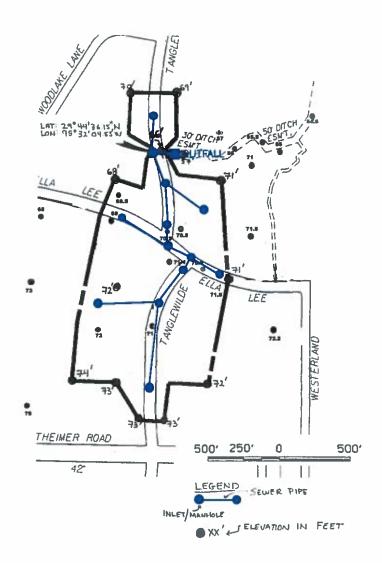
Tanglewilde Drive Storm Drain Inlet and Pipe Alignments
